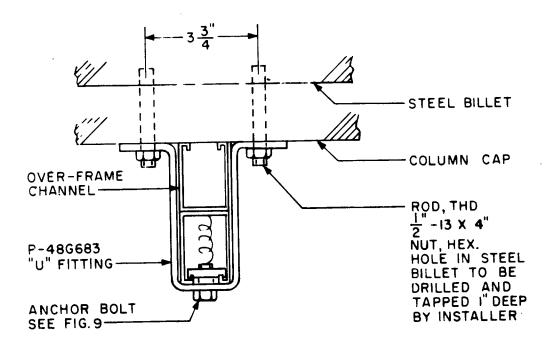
Fastening Overframe Channel to Column Cap (A&M Only)
